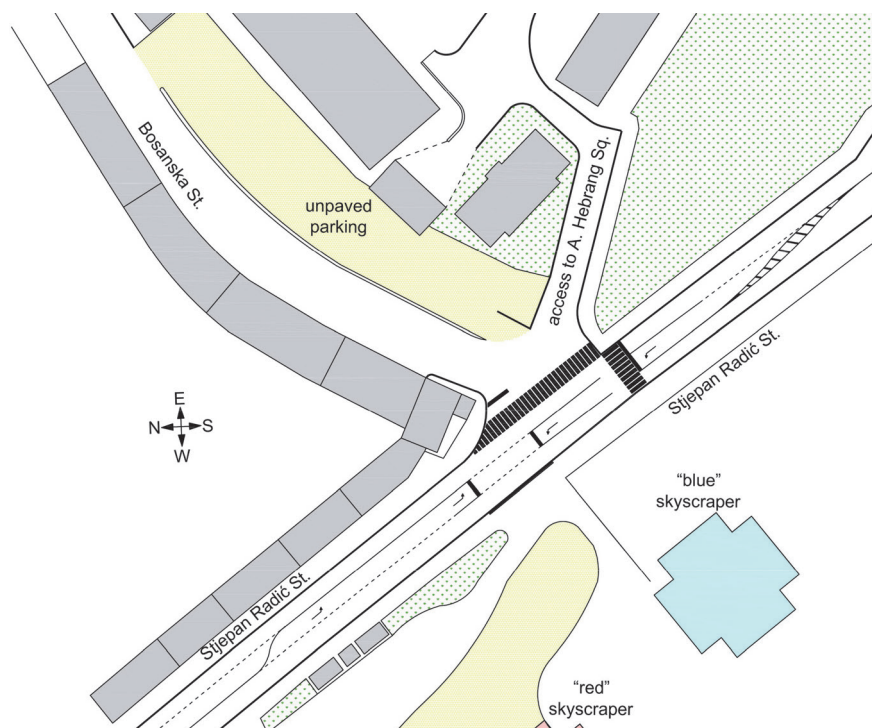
Stjepan Radić and Bosanska Street road intersection - traffic situation before 2014
